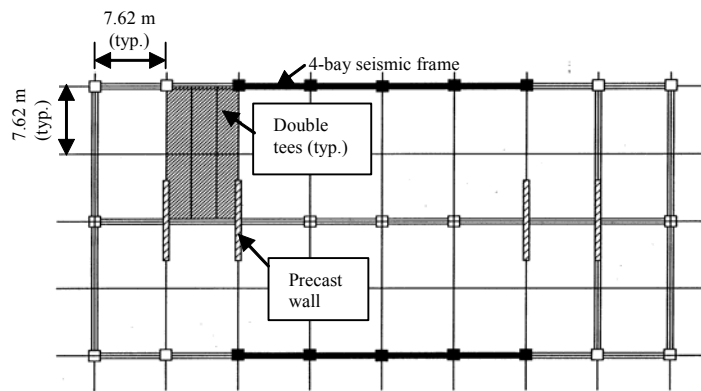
(b). Plan view of the precast concrete prototype building (Nakaki et al. 1999)
